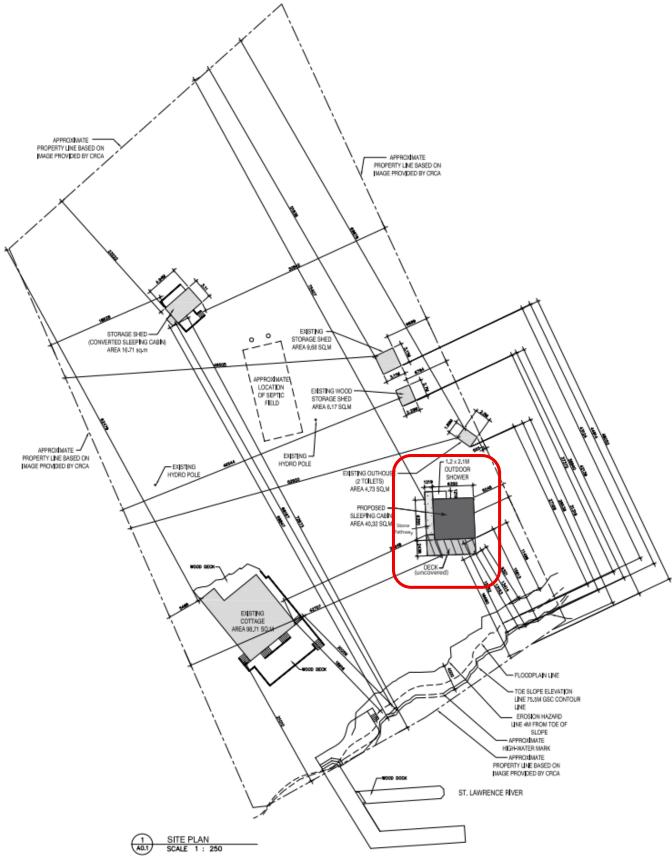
Concept plan with proposed cabin and associated uncovered deck outlined in red (Source: Songwood Contracting)
